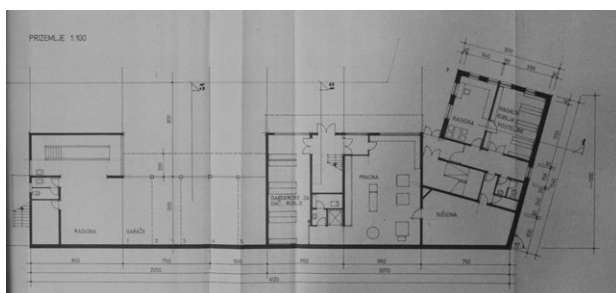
Nuns' house: ground floor plan, segment of the project for extension and reconstruction done by Vinko Grabovac in 1986 (Grabovac)
